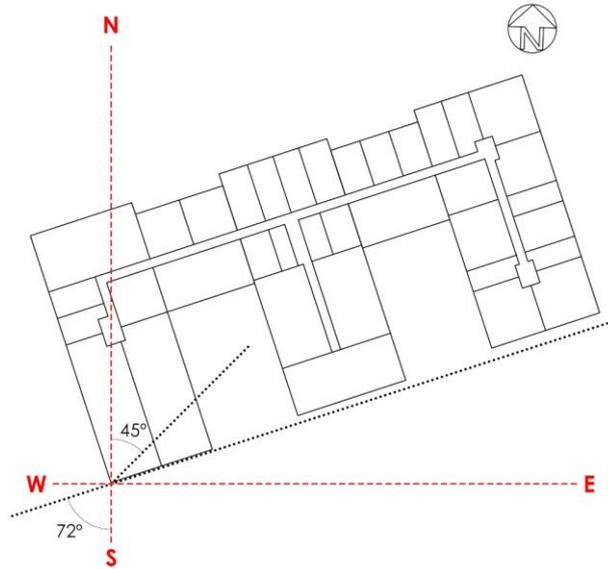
Building orientation: main façade facing within 90° due South and avoiding 45° due North as suggested in the BRE Guide (source: Author’s diagram)
